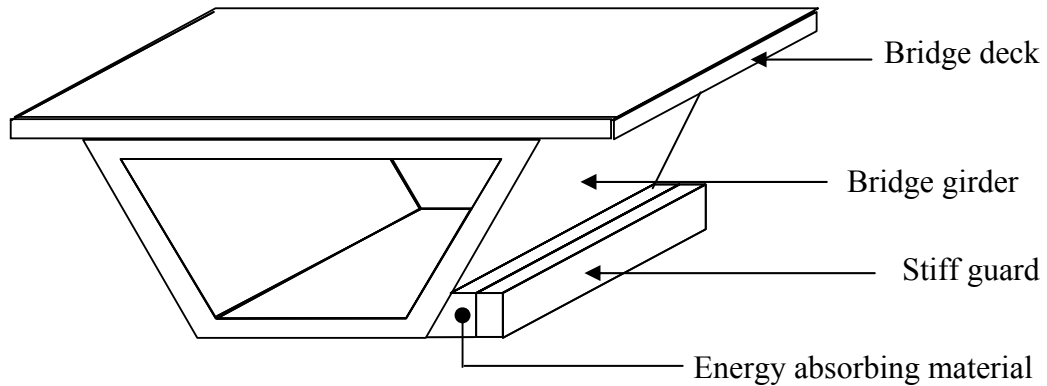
Sketch of the proposed bridge bumper for a bridge girder
